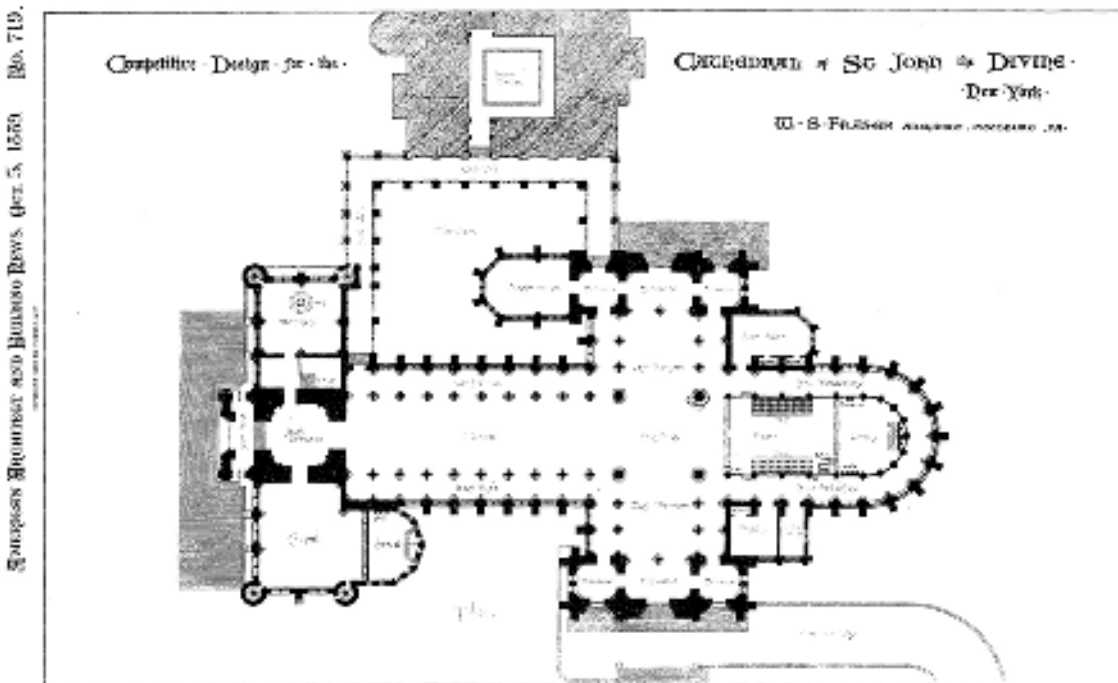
Fraser's floor plan for the Cathedral of Saint John the Divine, *The American Architect and Building News*, 5 October 1889.
